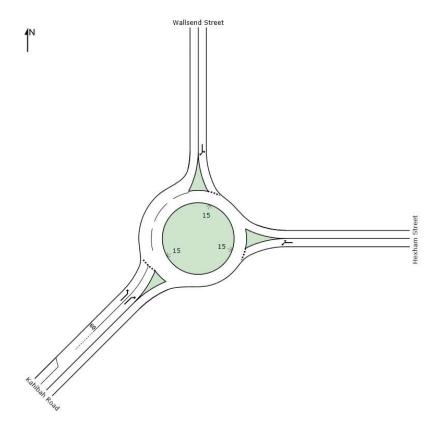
Kahibah Road, Wallsend Street and Hexham Street roundabout intersection with extra Kahibah Road Iane
